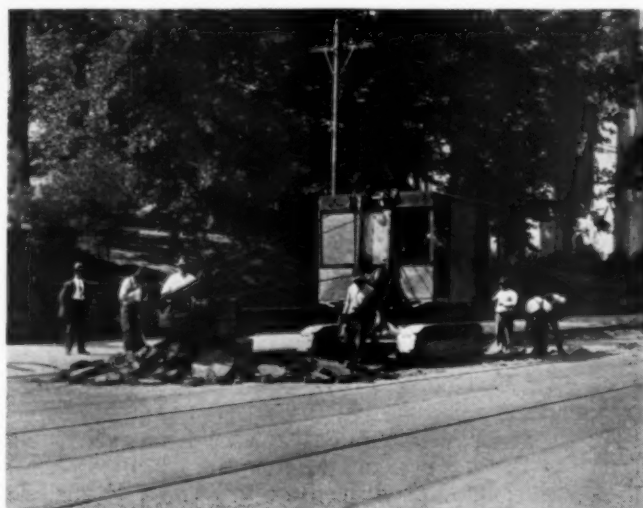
Removing Old Wood Block Pavement with $\frac{1}{2}$ -Yd. Shovel
